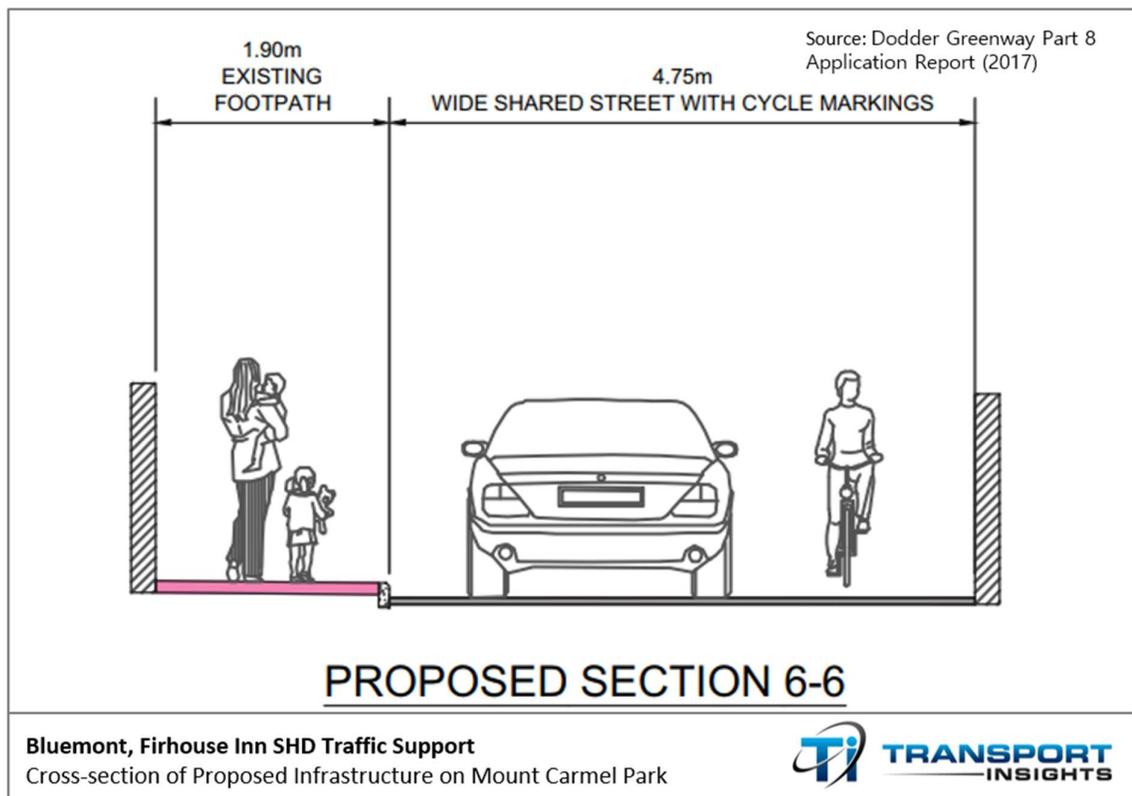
Cross-Section of Proposed Infrastructure on Mount Carmel Park
